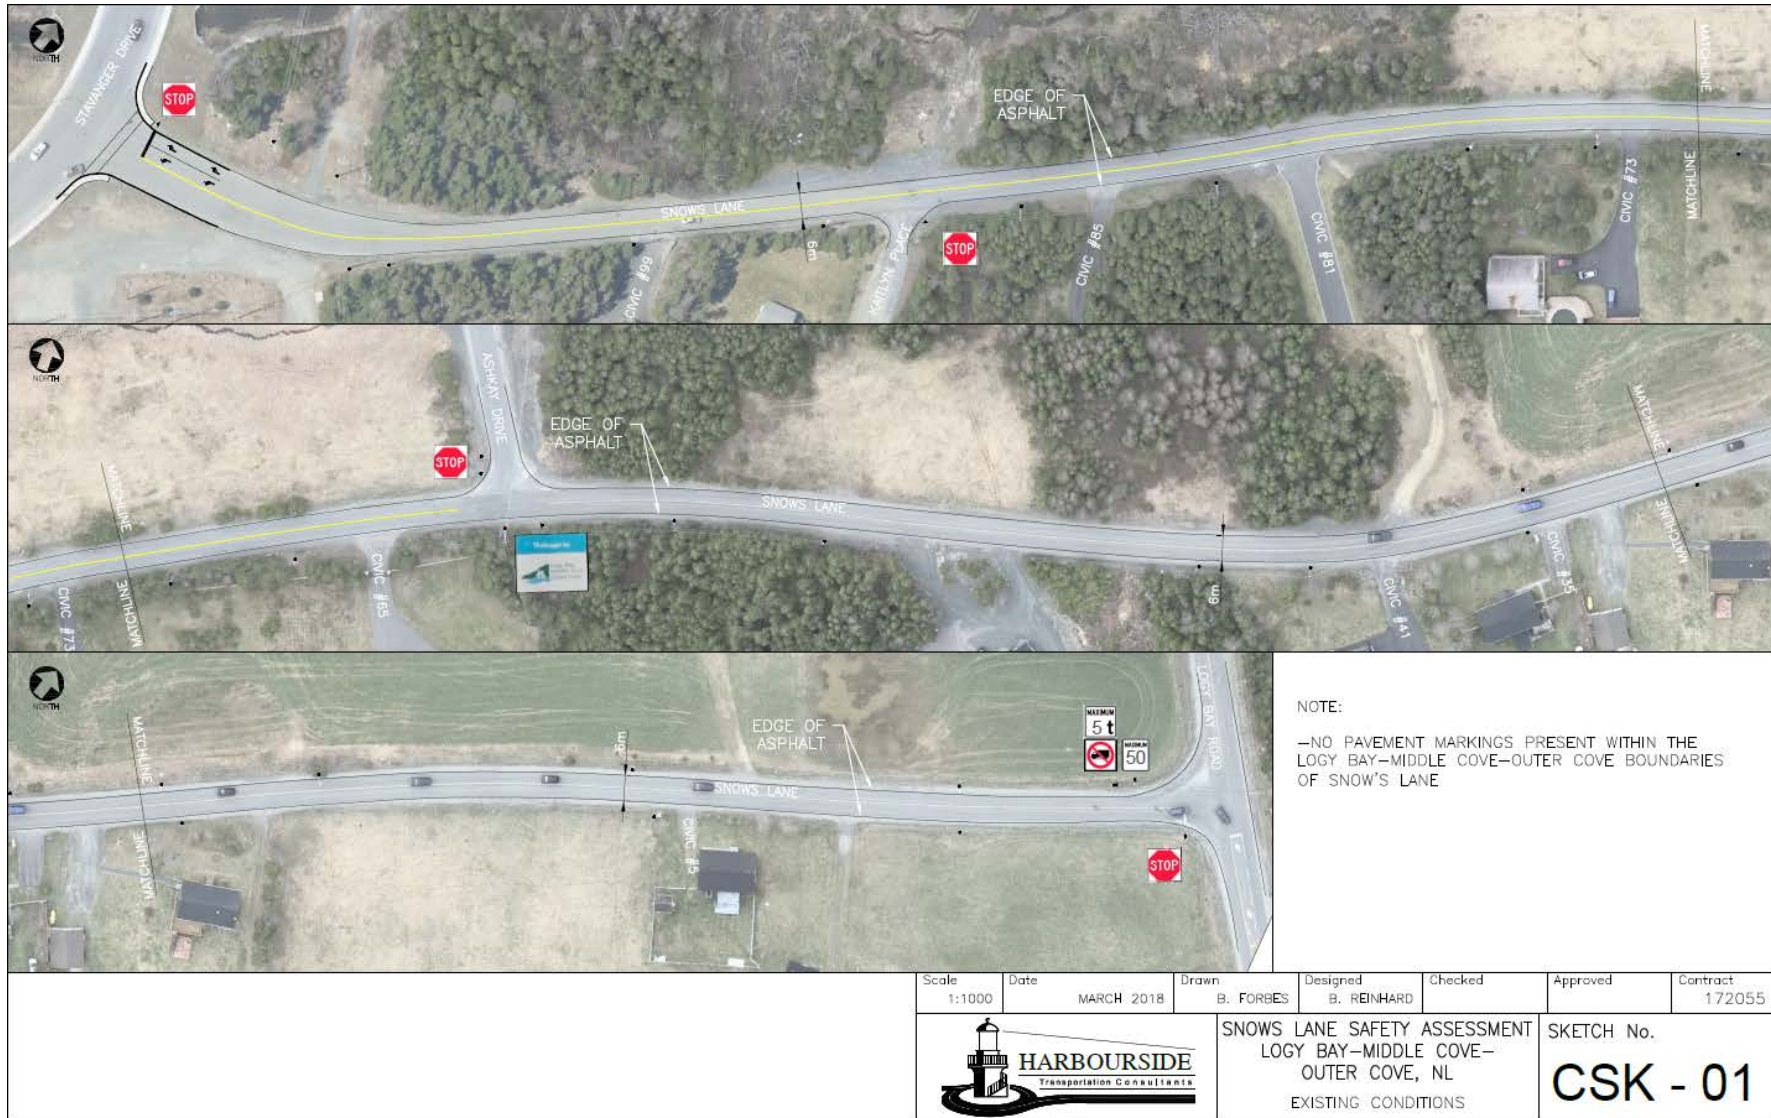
Plan view of existing signage and pavement markings on Snow's Lane
